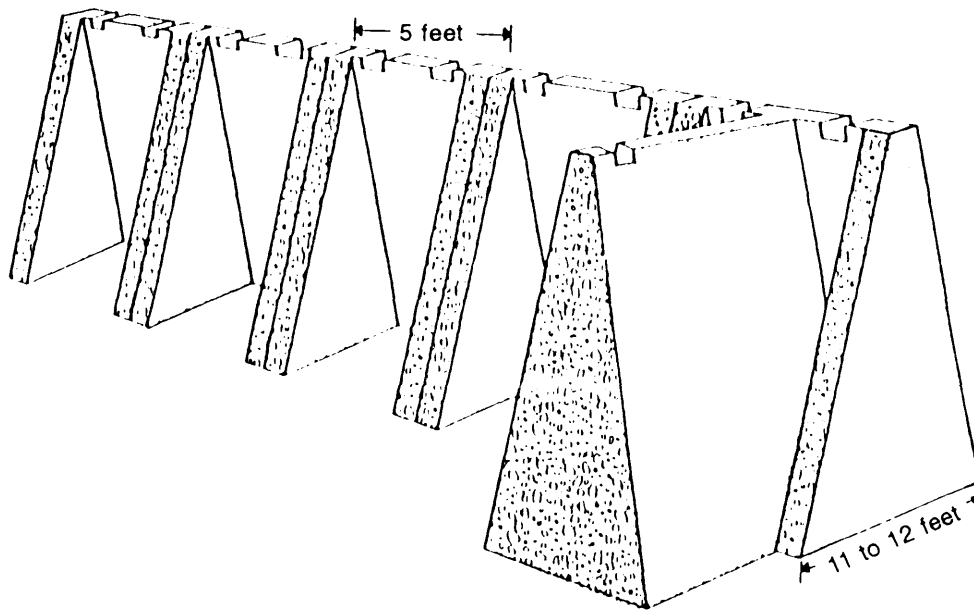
Movable, precast, concrete revetment with movable 11- to 12-foot sections
